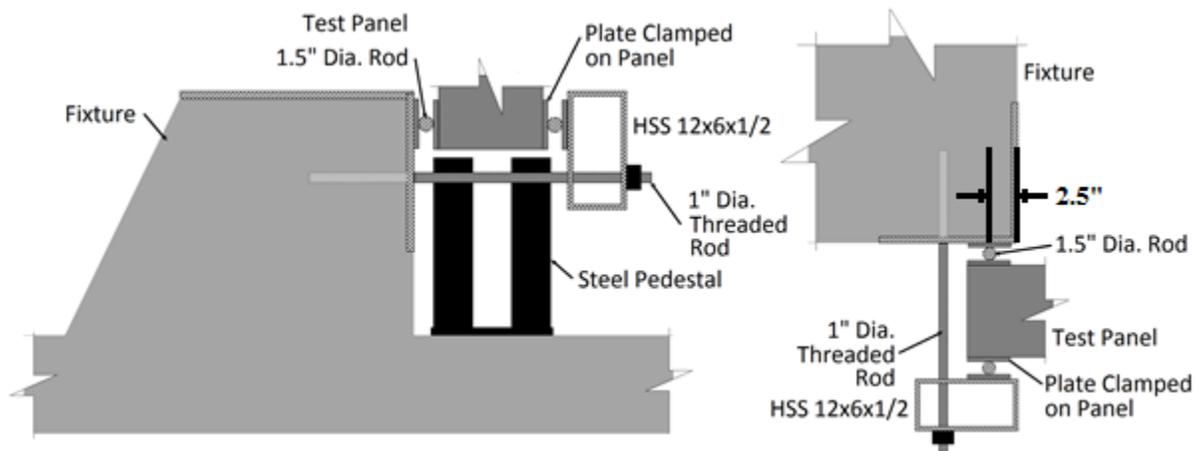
Steel Pedestals Used in Test 1 and Test 2
